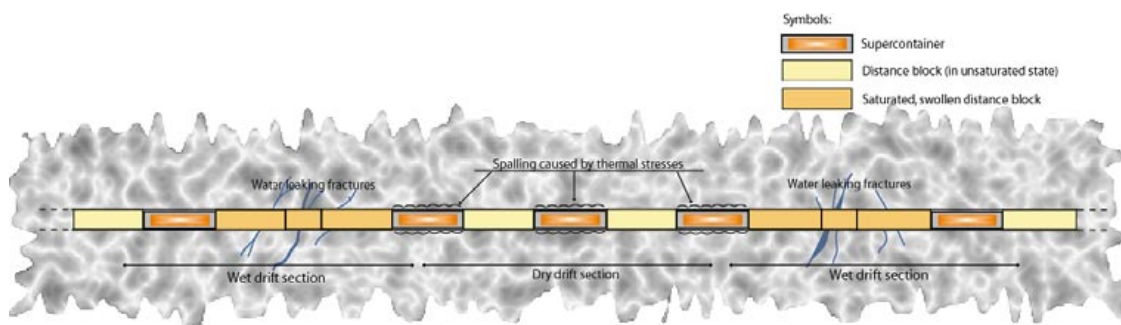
Case where spalling occurs only at supercontainer locations in tight drift sections between water-bearing fractures.
